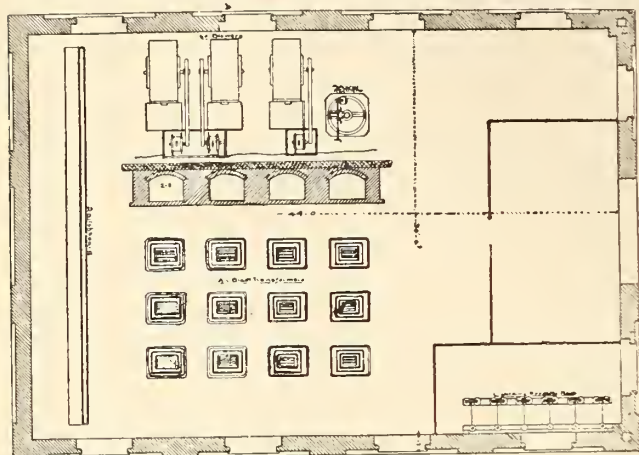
FLOOR PLAN OF SUB-STATION AT ROSSLAND.
